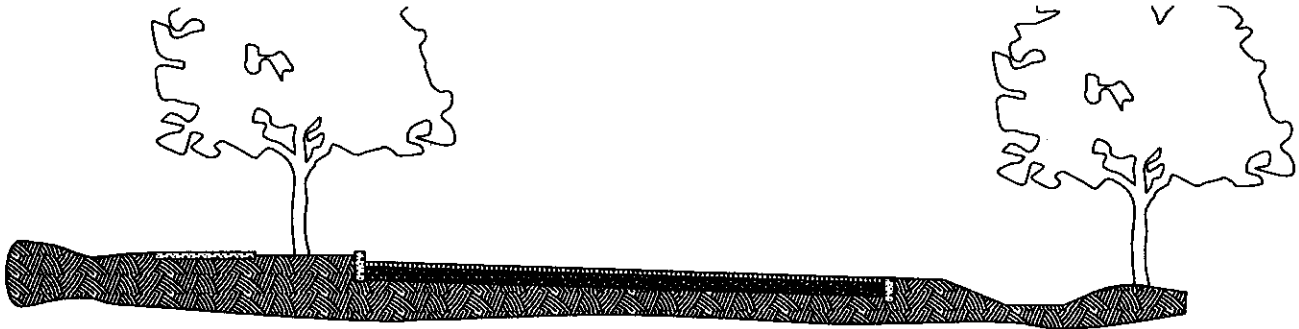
Street Design Option B - Shed Section with Swale Drainage
